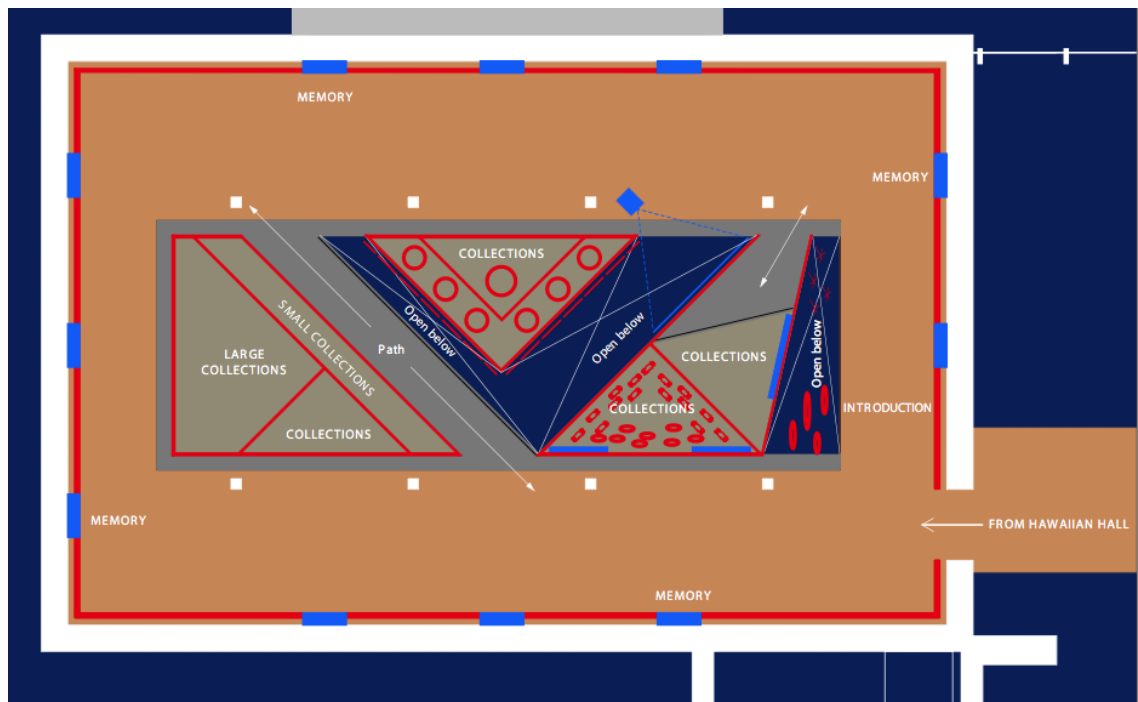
Suggested floor plan, PH, BPBM. Conceptual plan RAA, 20 April 2006: 50
